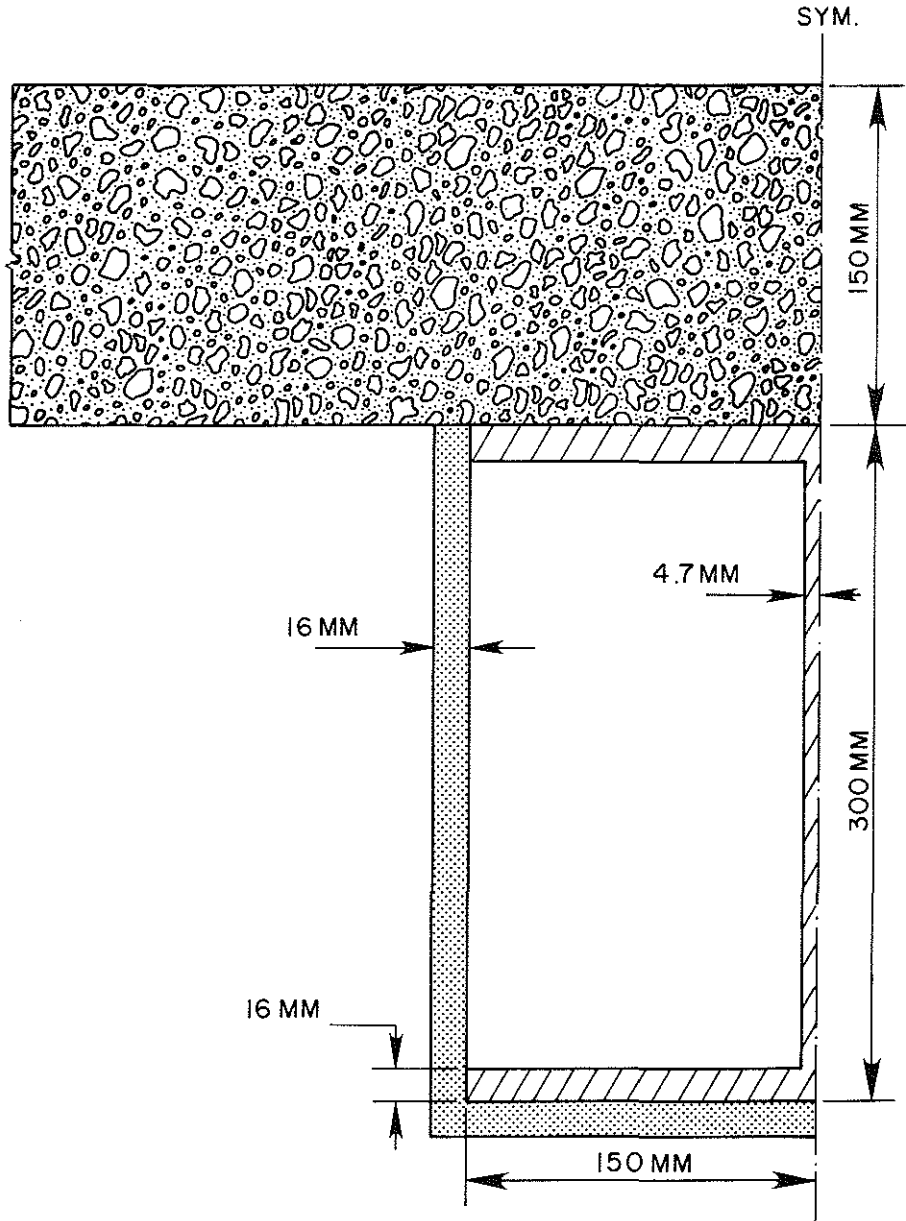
Dimensions of concrete slab, steel beam, and gypsum board insulation
